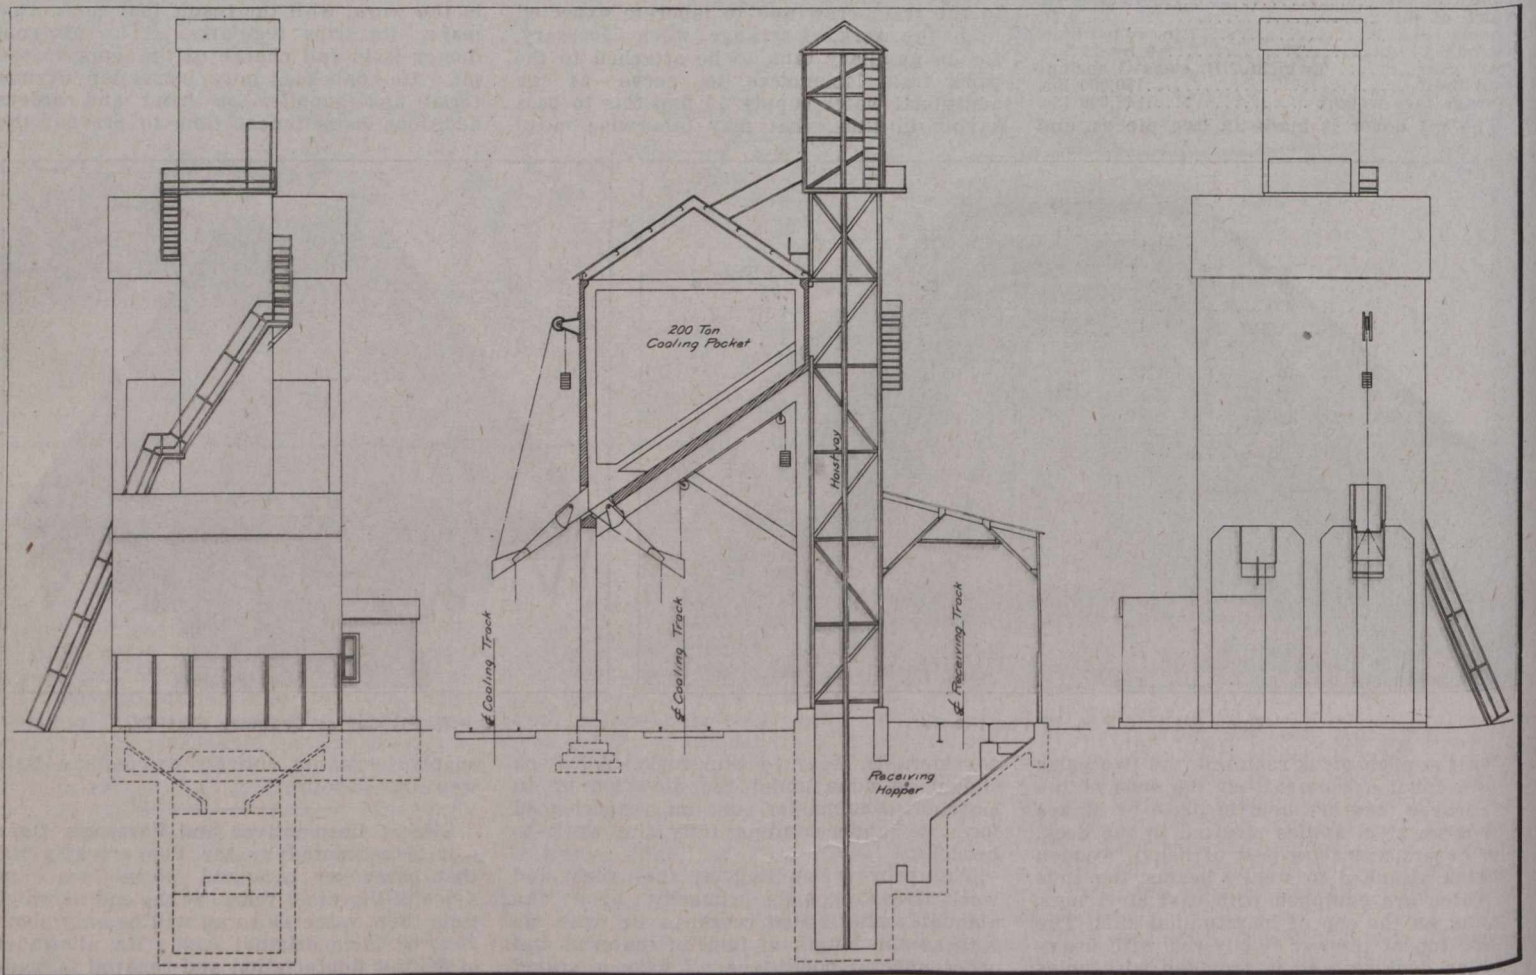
Typical Coaling Plant on the National Transcontinental Ry., Six of Which Are Being Built.
